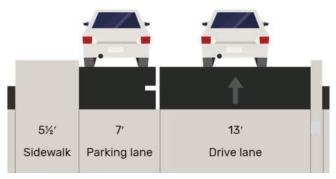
JUNKER STREET CROSS-SECTION WITH PARKING
